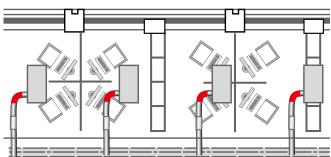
Installation example. Straight air connection, alternative with 90° bend.
